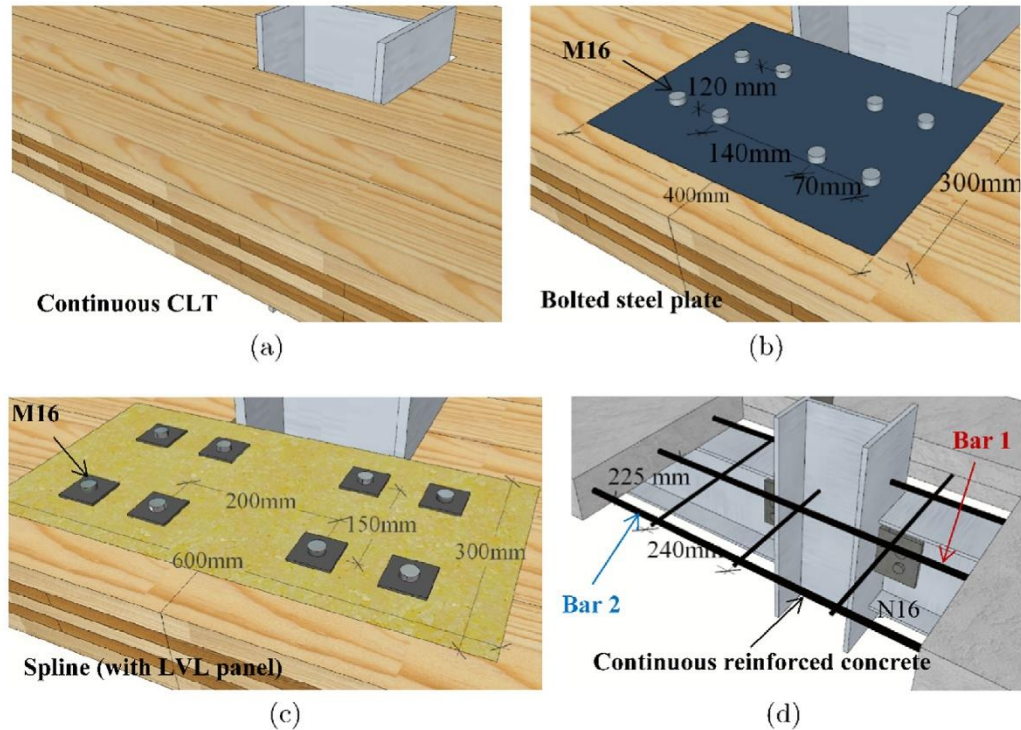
5 Details of the CLT-to-CLT slab connections across the columns in specimens (a) CJ2, (b) CJ3 and CJ4, (c) CJ5 and (d) CJ6 (Ataei, 2019).
